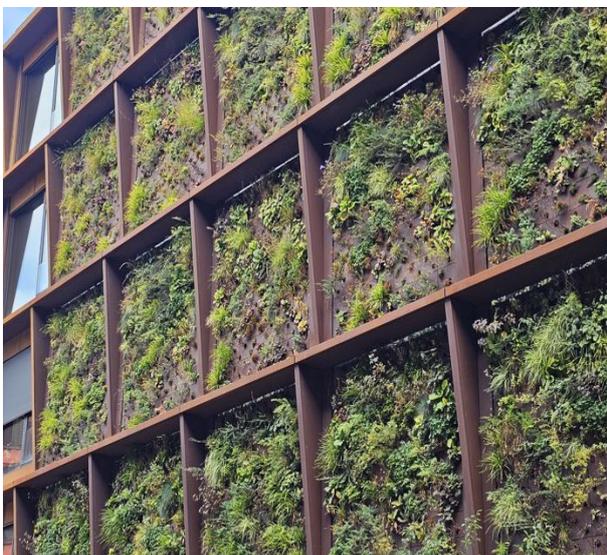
Green facade structure of Porten building [created by author's, 2024]
